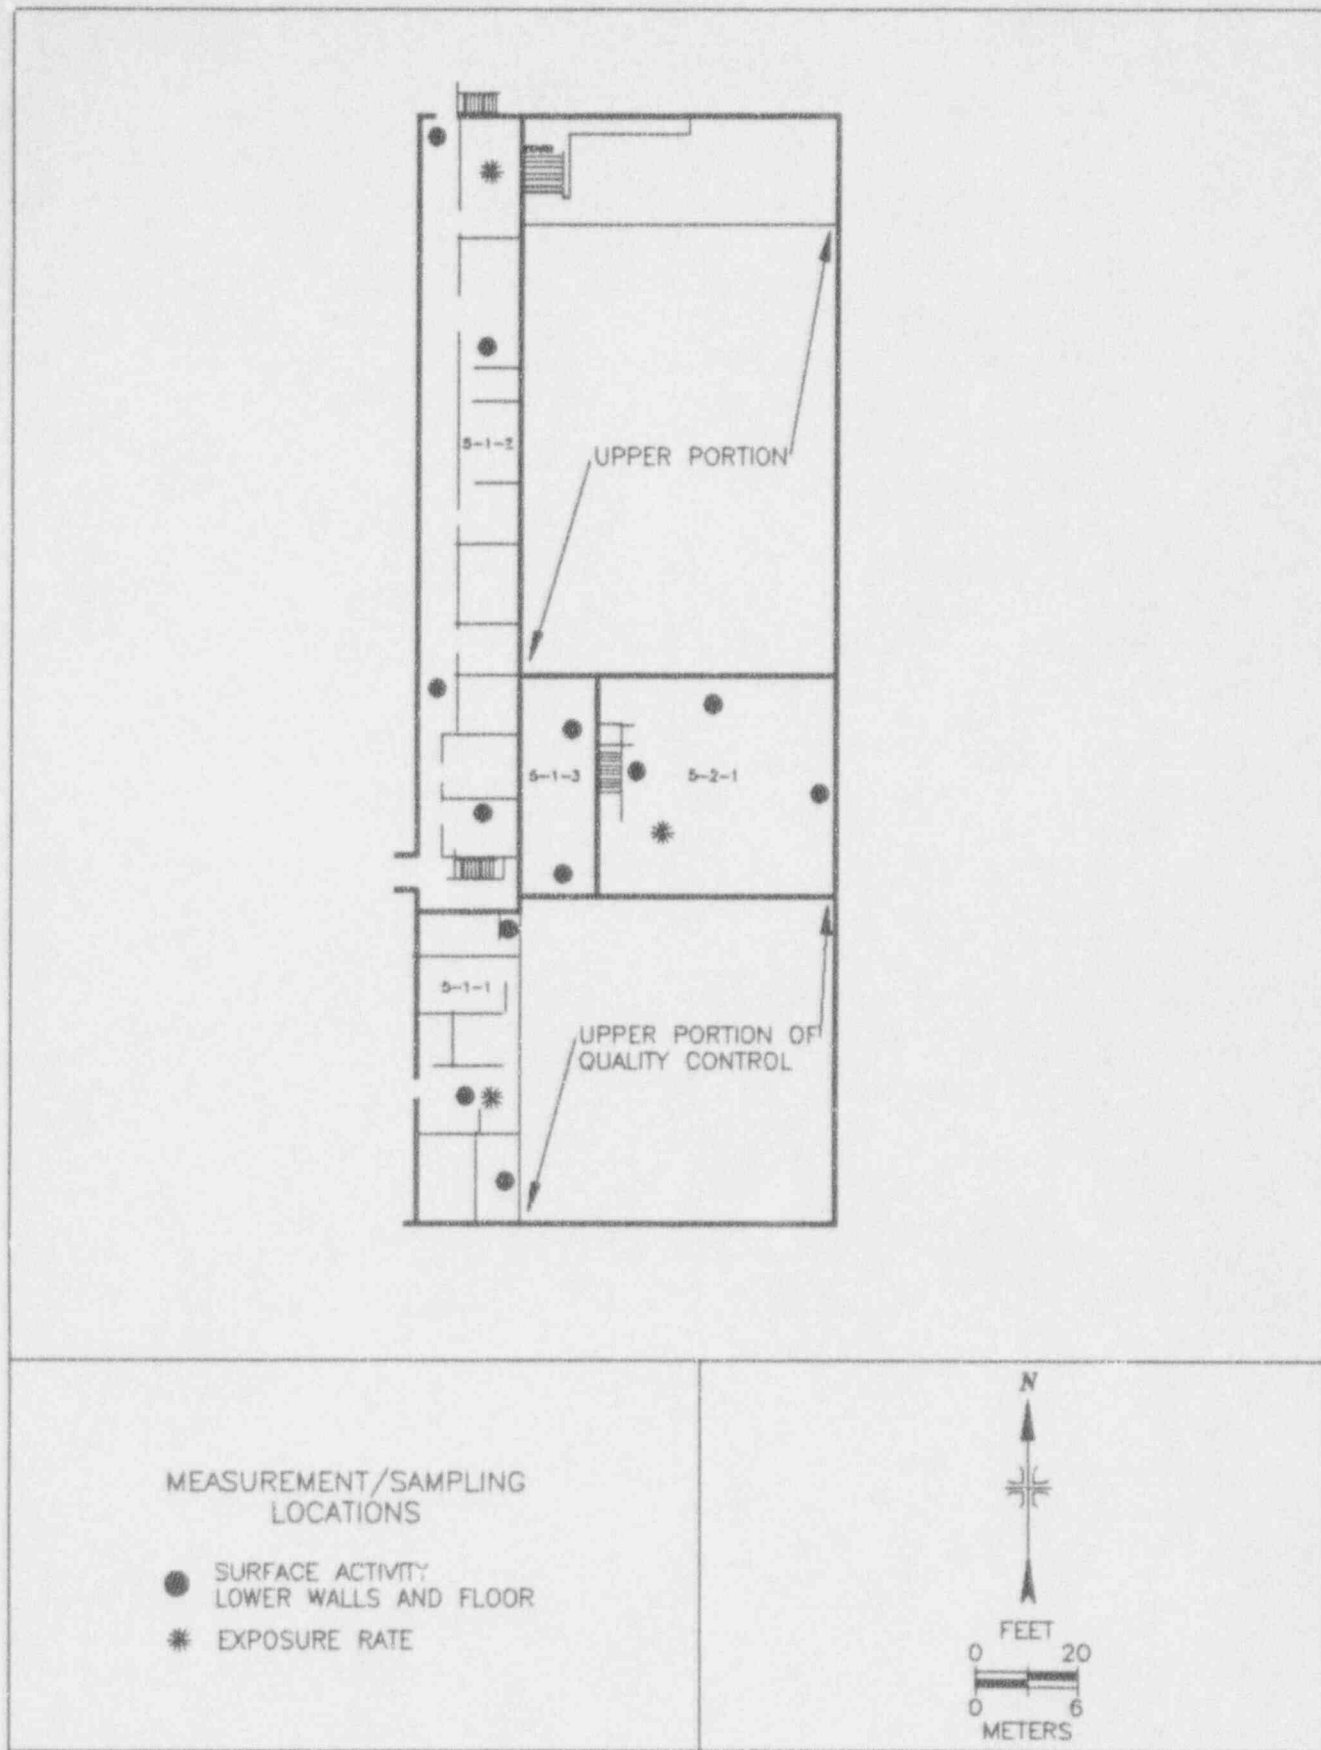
Building 6, Second Floor – Measurement and Sampling Locations
